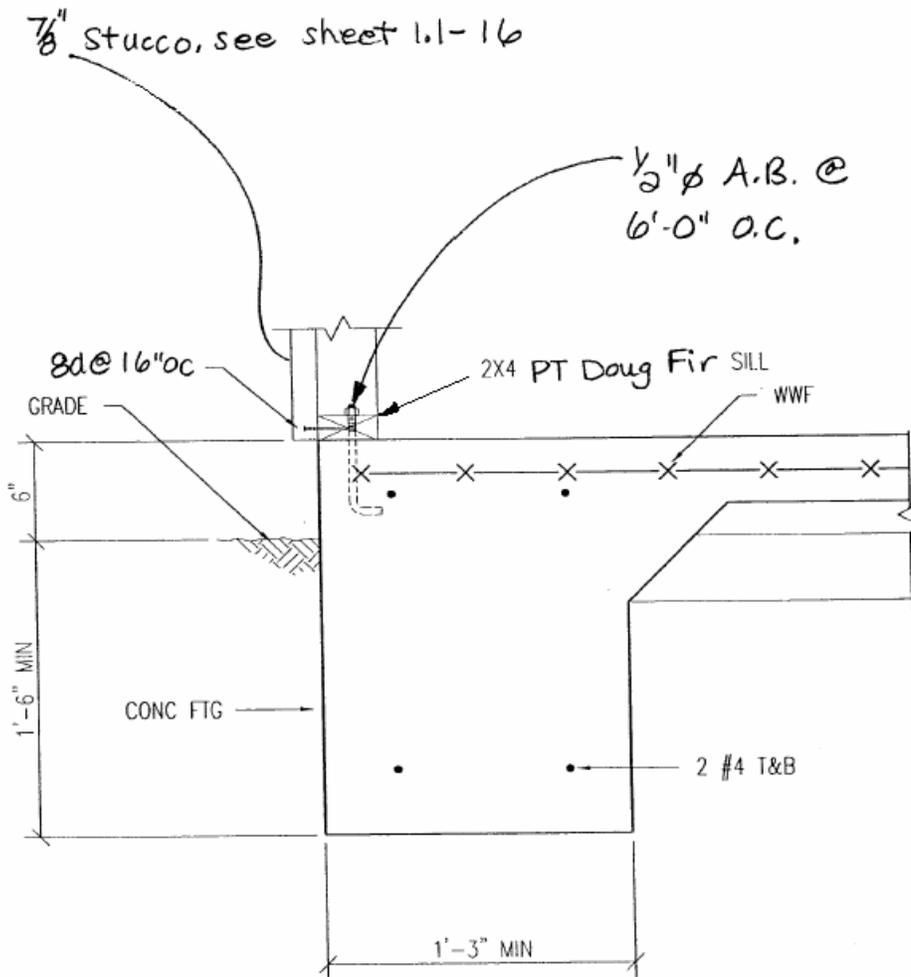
Index building 4 typical exterior footing at garage (detail 9-S2)
